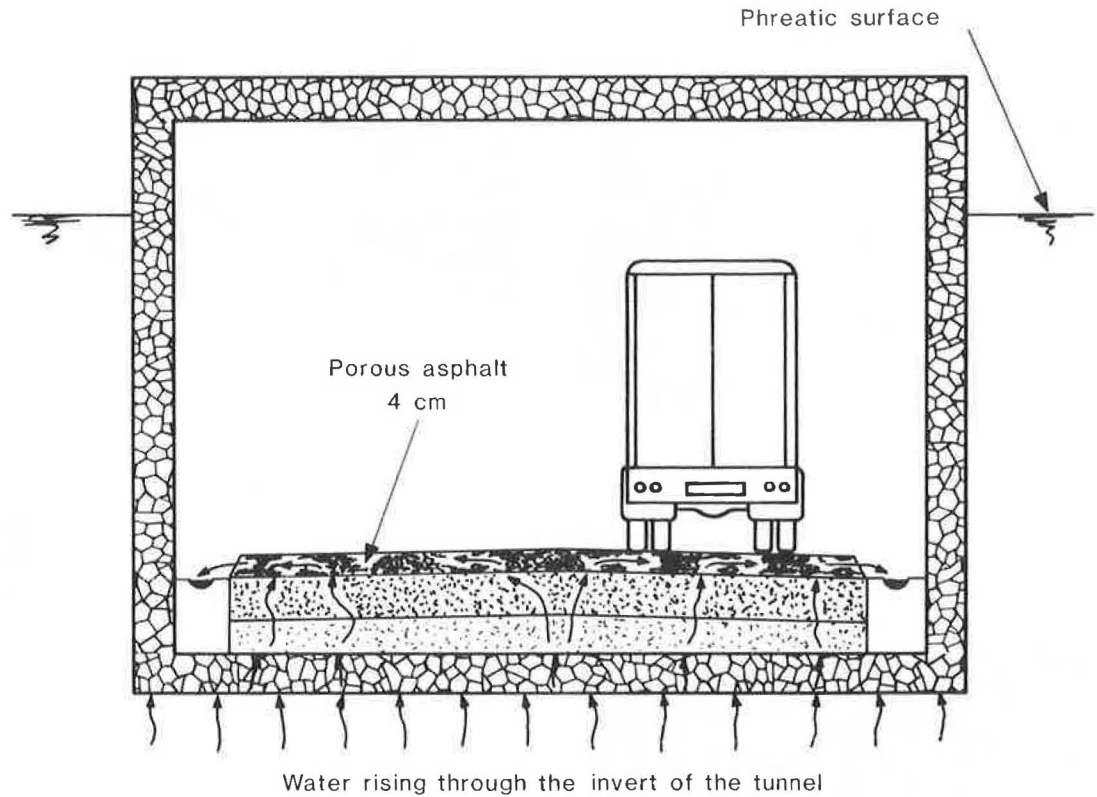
Overlaying an existing pavement in a tunnel with porous asphalt.
